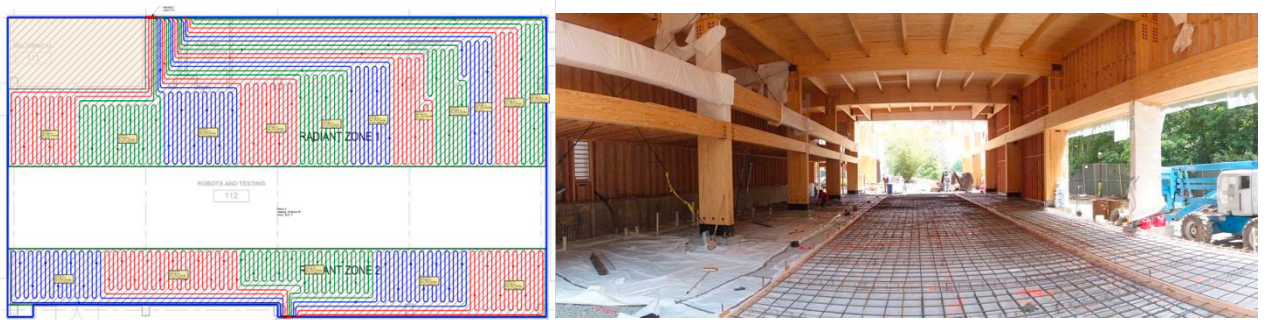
(a) radiant floor layout in the main space (b) construction of the floor
